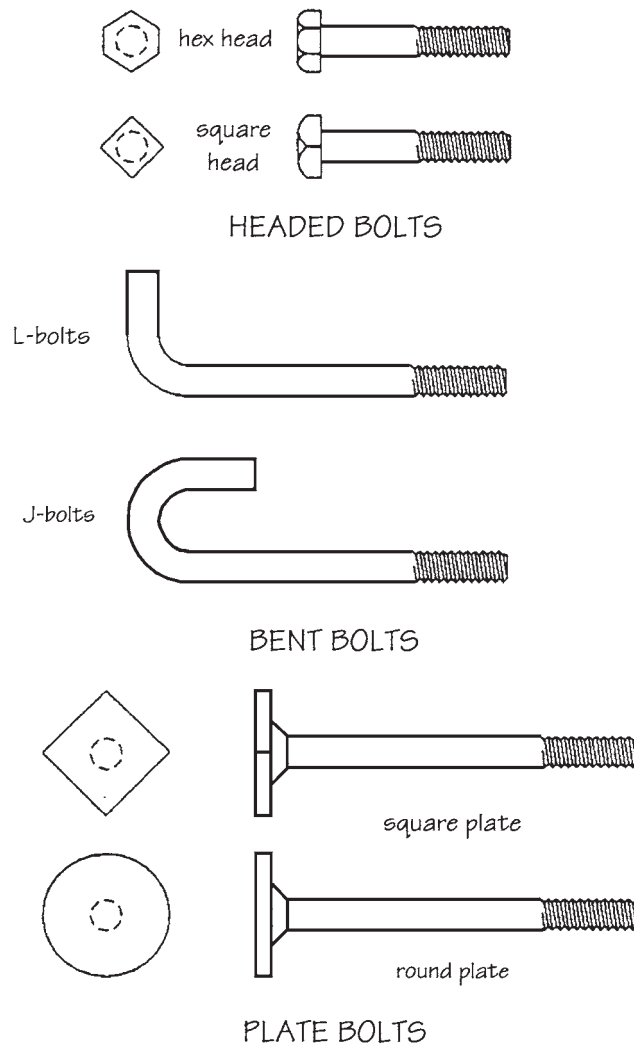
Anchor bolts for masonry. (From *Masonry Standards Joint Committee, Building Code Requirements for Masonry Structures, ACI 530/ASCE 5/TMS 402*, and *Specifications for Masonry Structures, ACI 530.1/ASCE 6/TMS 602*.)
